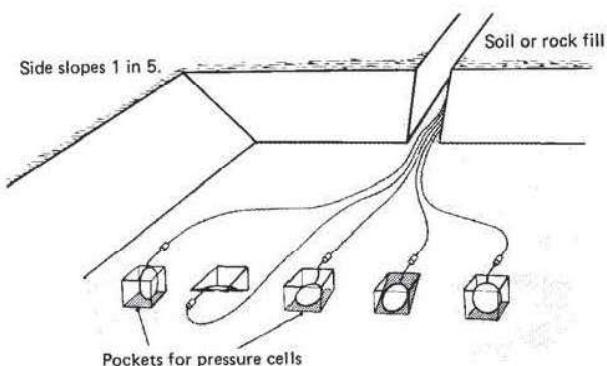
Typical layout of embedment earth pressure cells (courtesy of Soil Instruments Ltd., Uckfield, England).
